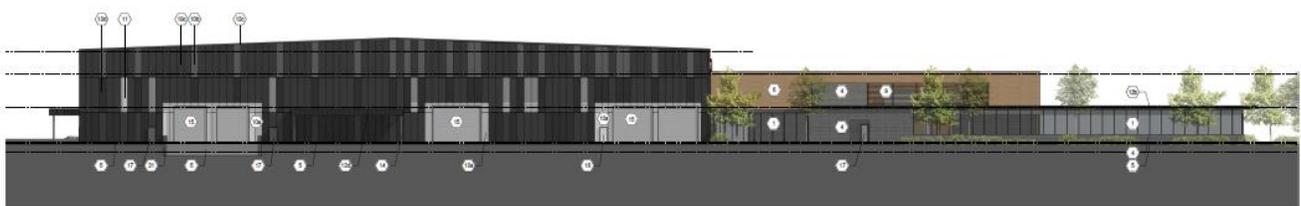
Concept Rendering for the western portion of 3713 Borrisokane Road
